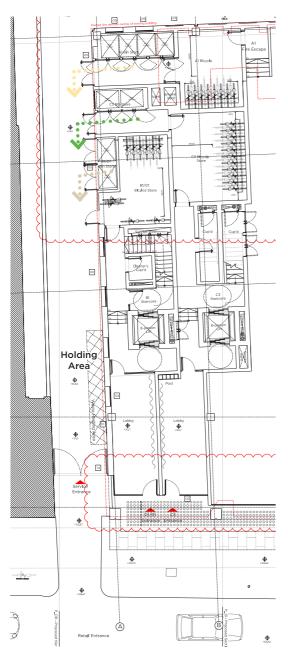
Waste storage on ground floor for A1, B1/D1 & C3 use
